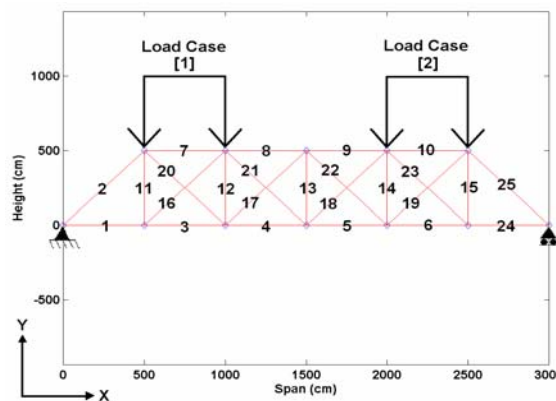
Loading cases with arbitrary truss structure layout [39].
